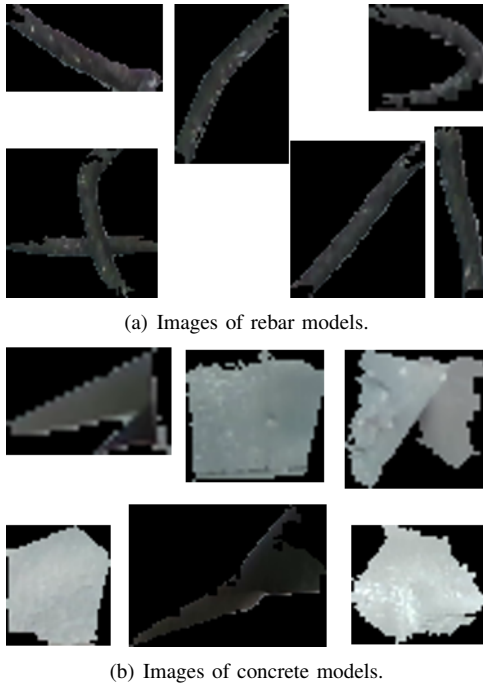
Superpixel image examples of models of rebars and concrete lumps.
